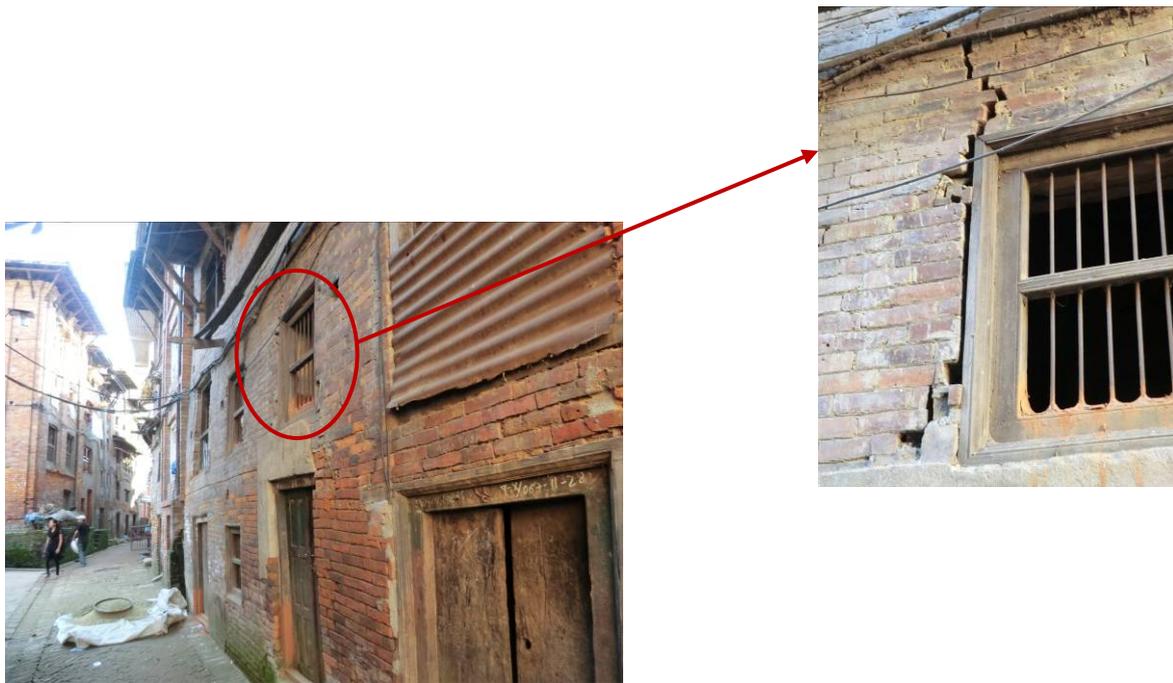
A building with cracks starting from the interface between window and masonry wall. Cracks could also have propagated from the corner of lintels. The figure also shows permanent out of plane deformation of walls, which has resulted due to self weight of the building itself, prior to the earthquake.
